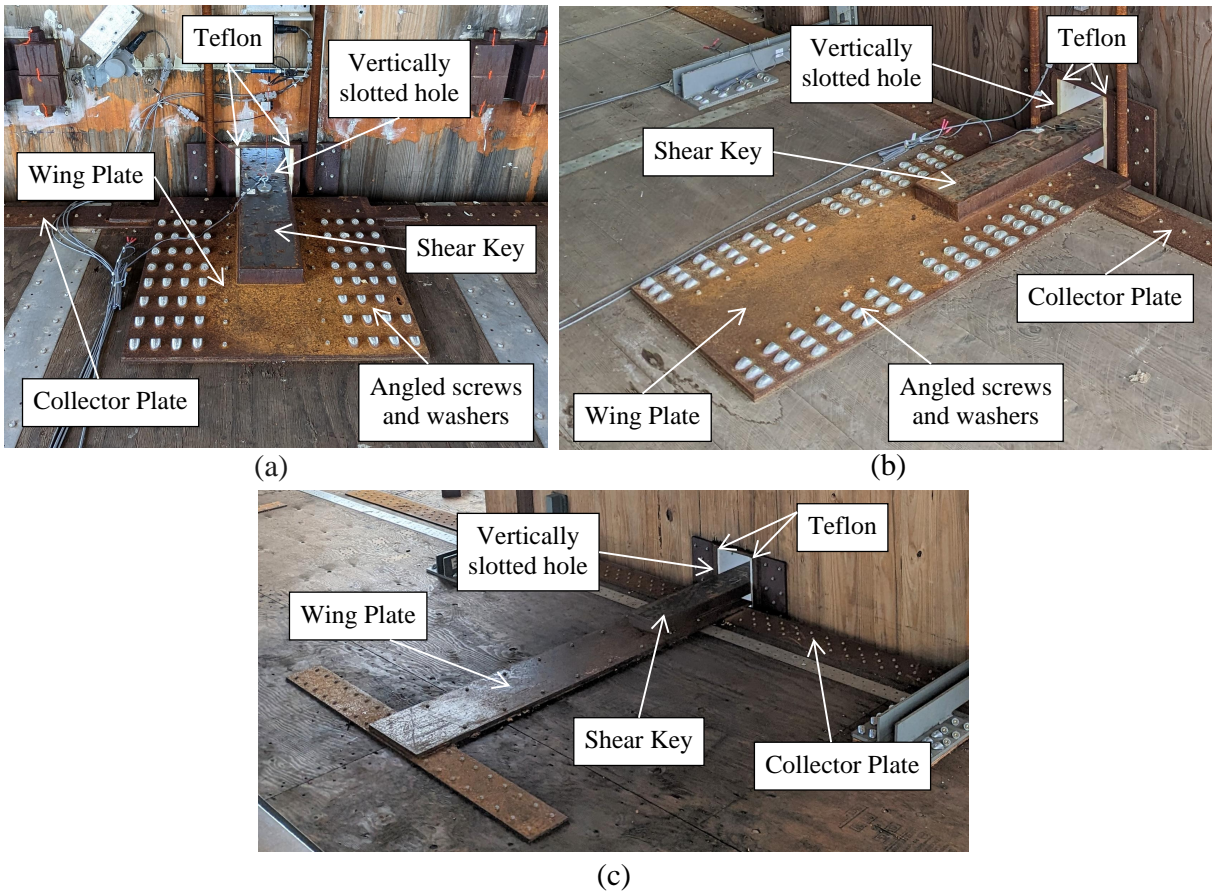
Wall-to-diaphragm shear transfer connections for (a) the CLT walls on non-sheathed floors, (b) the MPP walls on non-sheathed floors, and (c) the walls on sheathed floors
